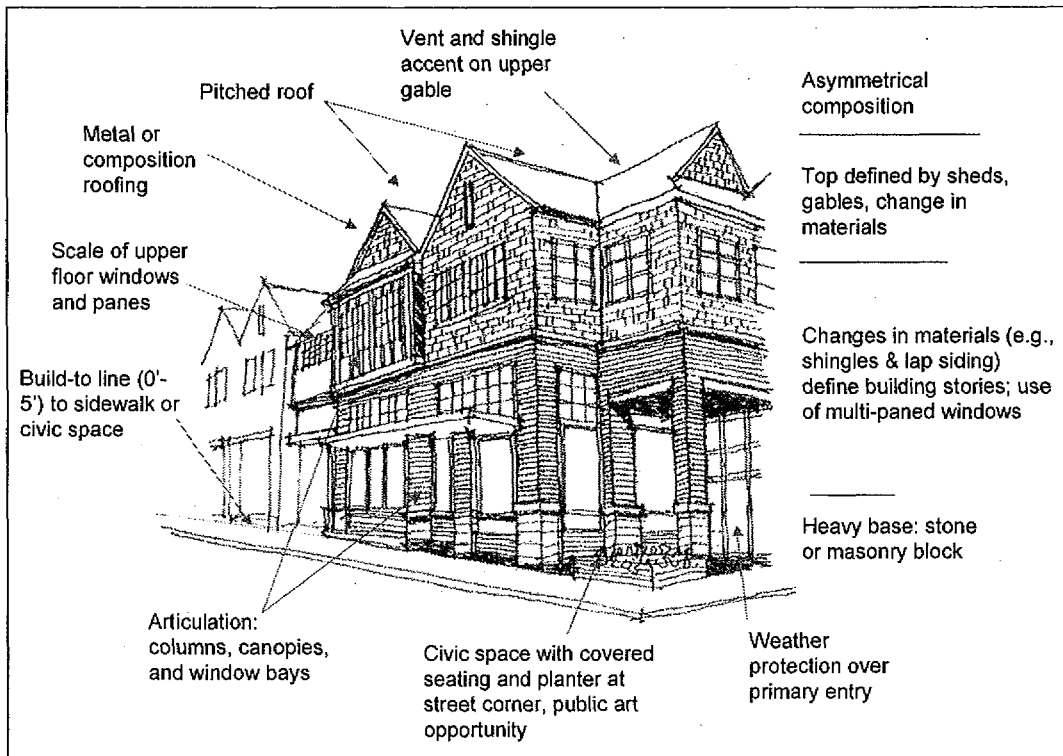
F: Typical Building Elements in Sandy Style (Mixed Use Example)
